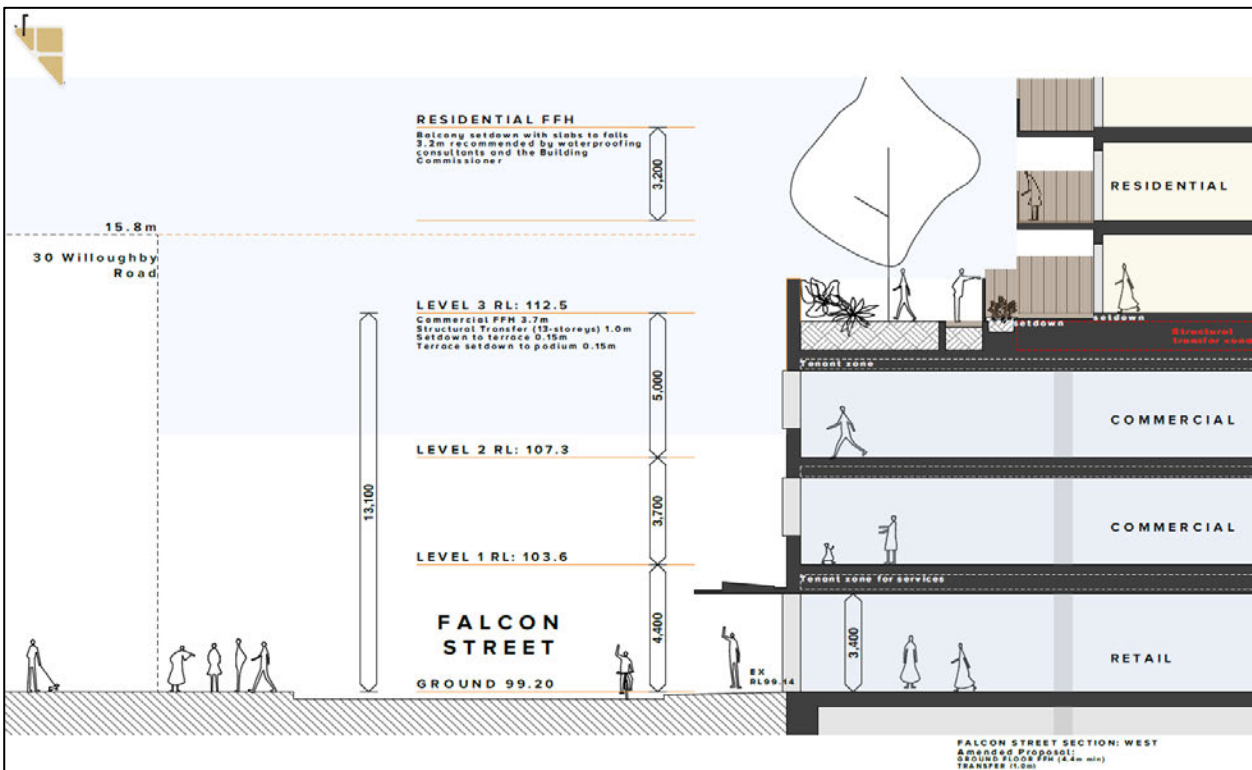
Section of proposed podium development where the street height is lower (source: Turner)
